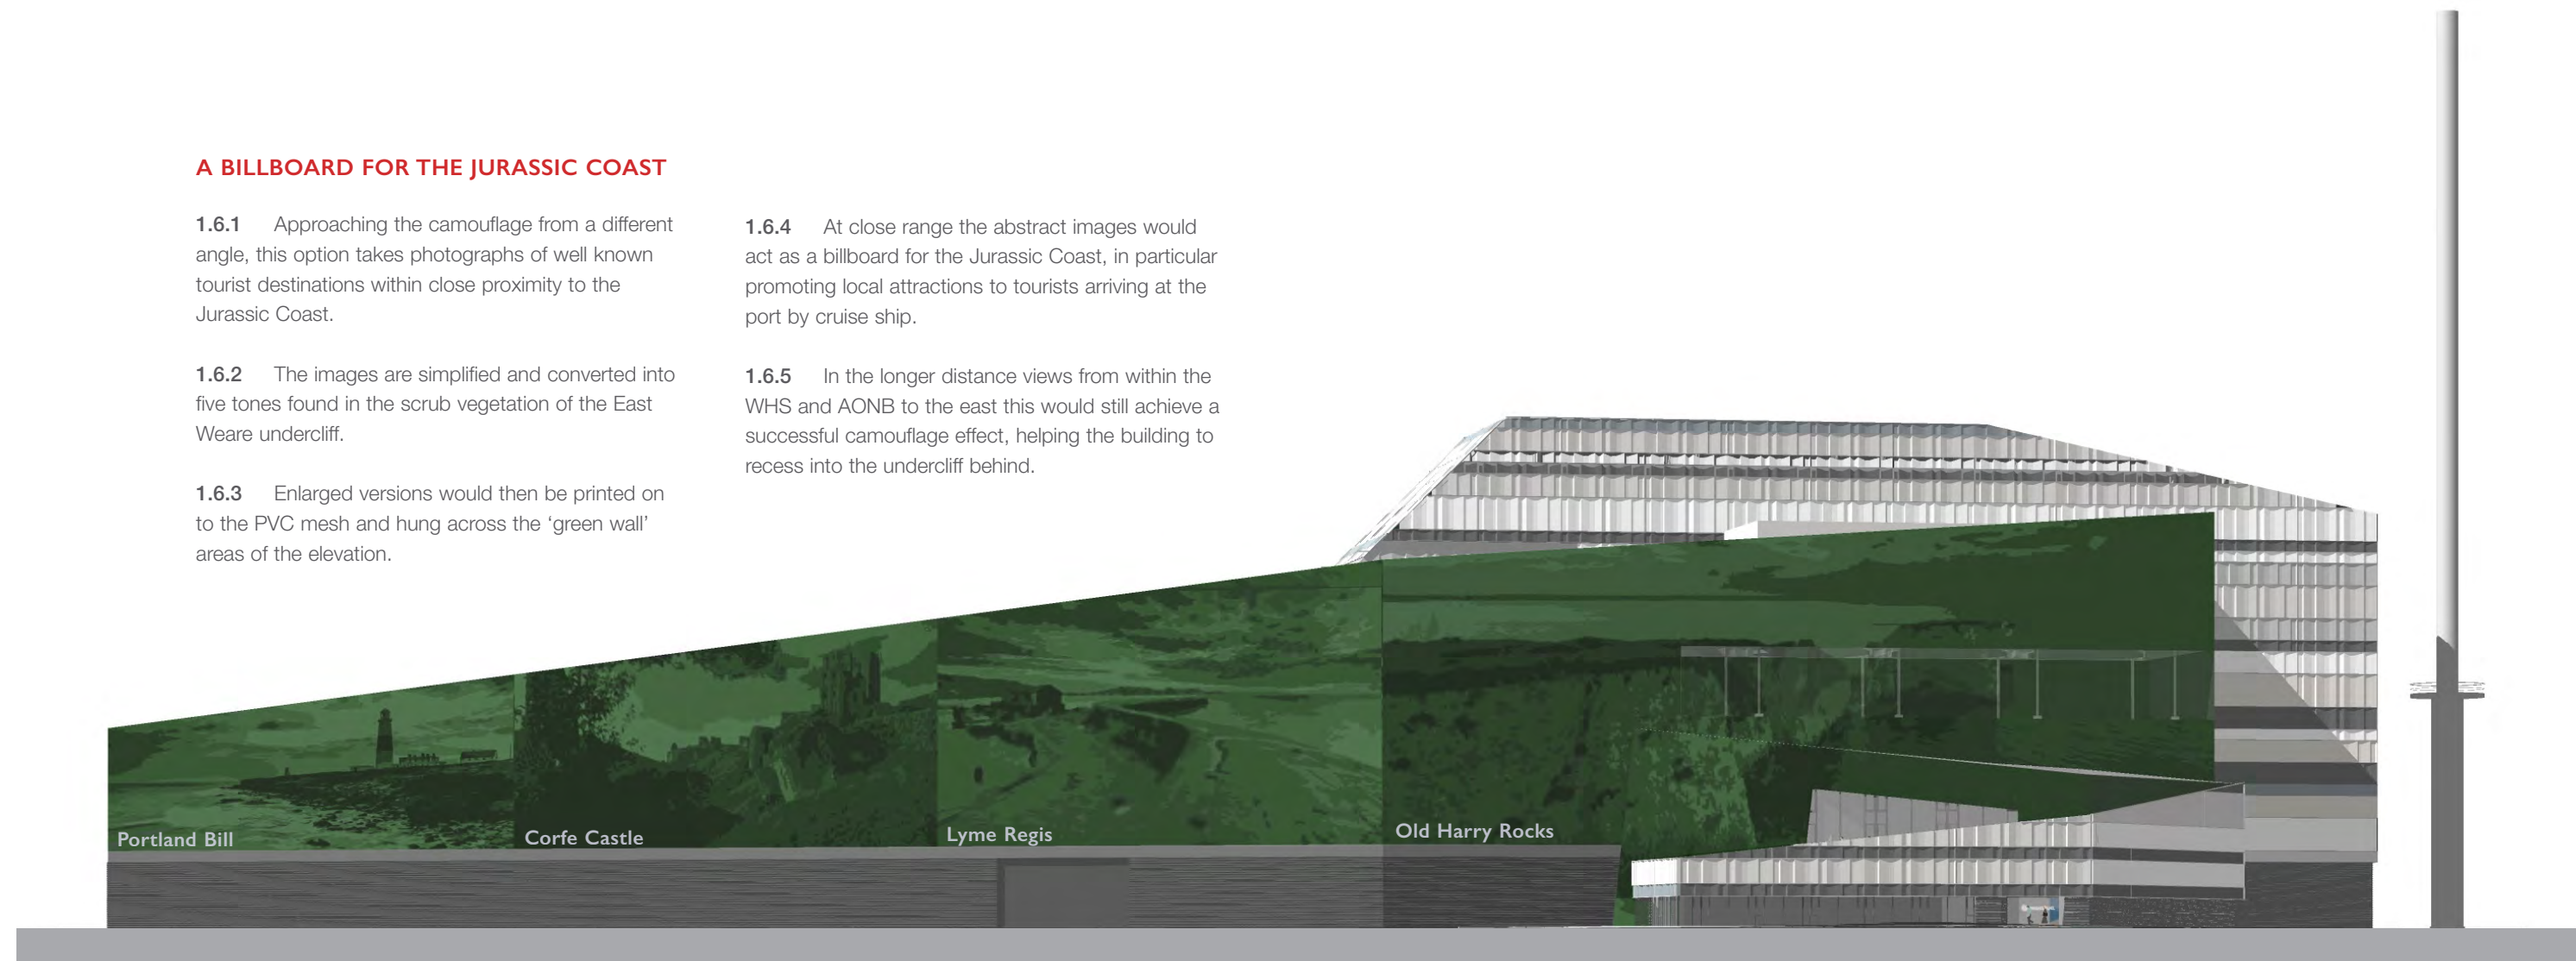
North east elevation with Jurassic Coast billboard camouflage
